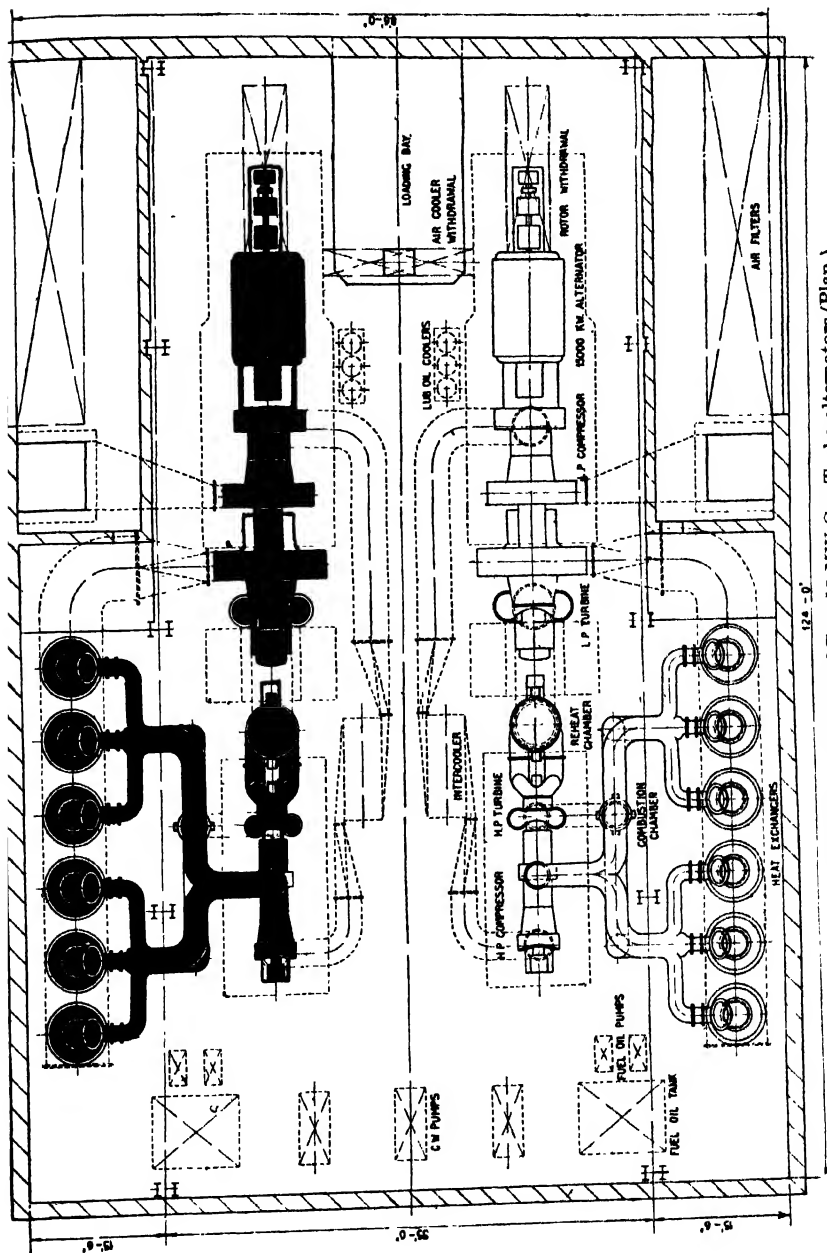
(A). Layout of Two 15 MW Gas Turbo-alternators (Plan.)
